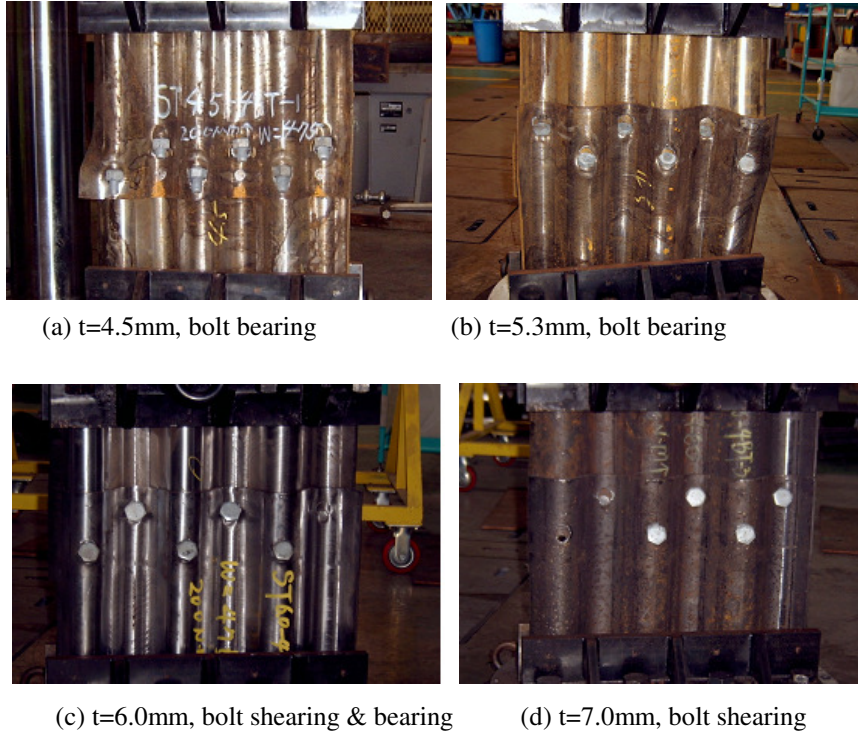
Failure of bolted seam with a F8.8T bolt for SS490 plate
